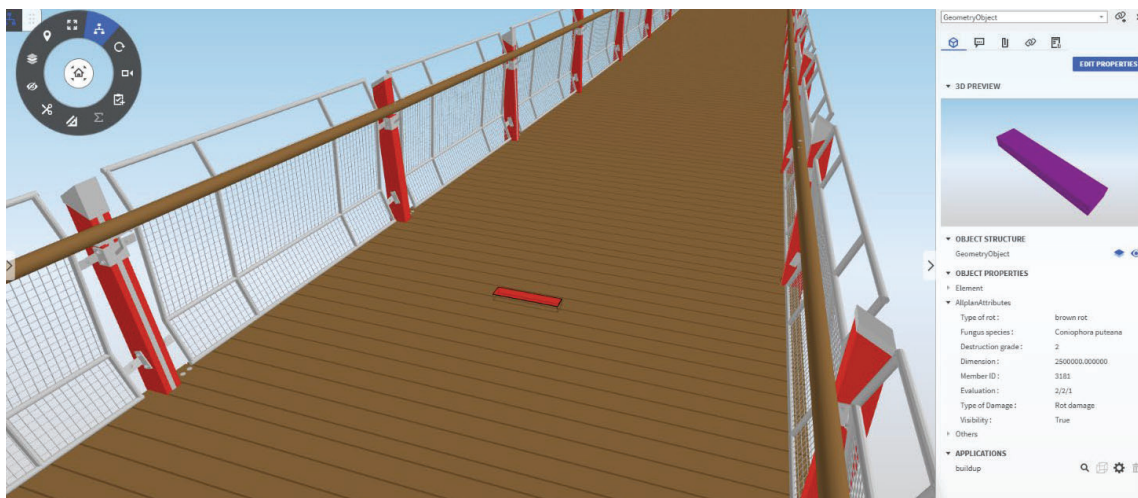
Localisation of a defect as a damage object in the damage model of a timber bridge (Image: FHE, Florian Planert)
